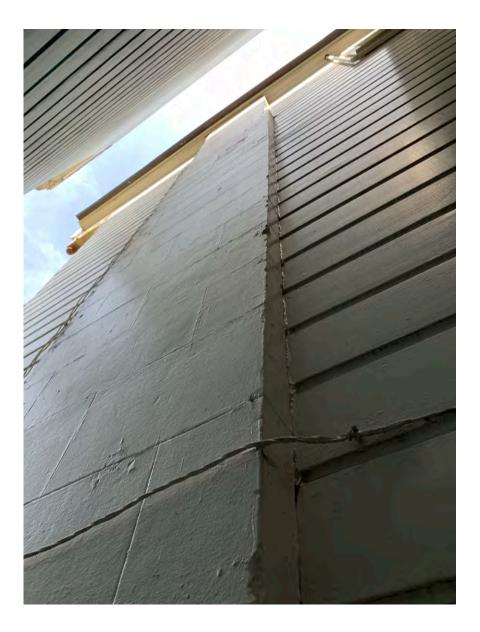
714 Steiner, primary Steiner Street façade, detail of balcony above porch
